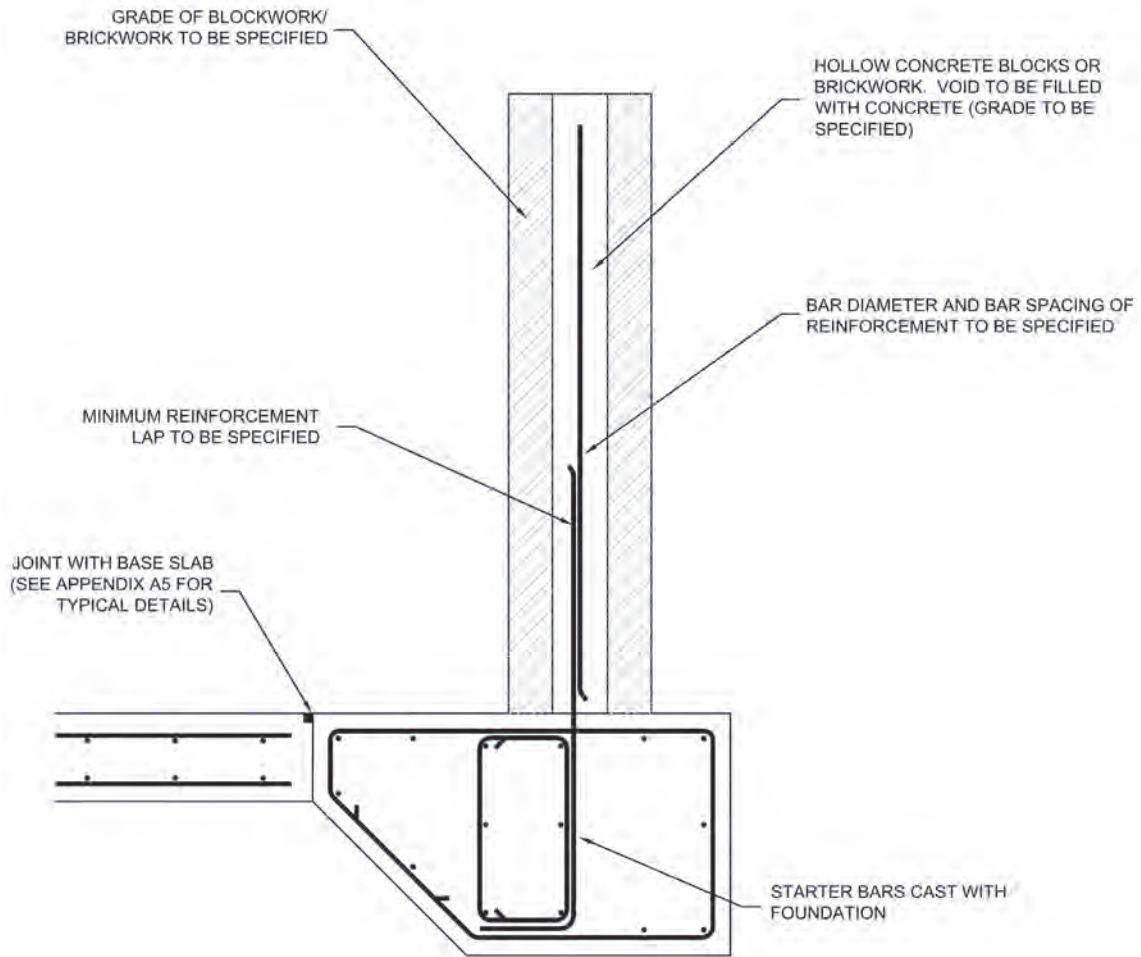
Typical detail for a reinforced blockwork/brickwork wall
